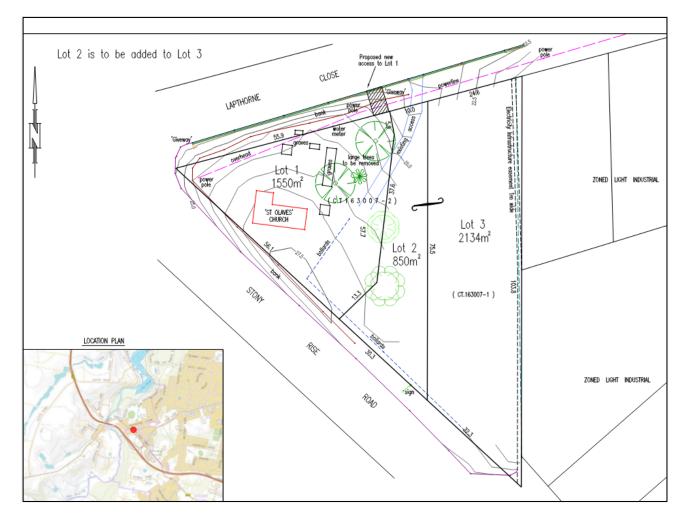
Boundary adjustment plan (Michell Hodgetts Surveyors, 2022)
